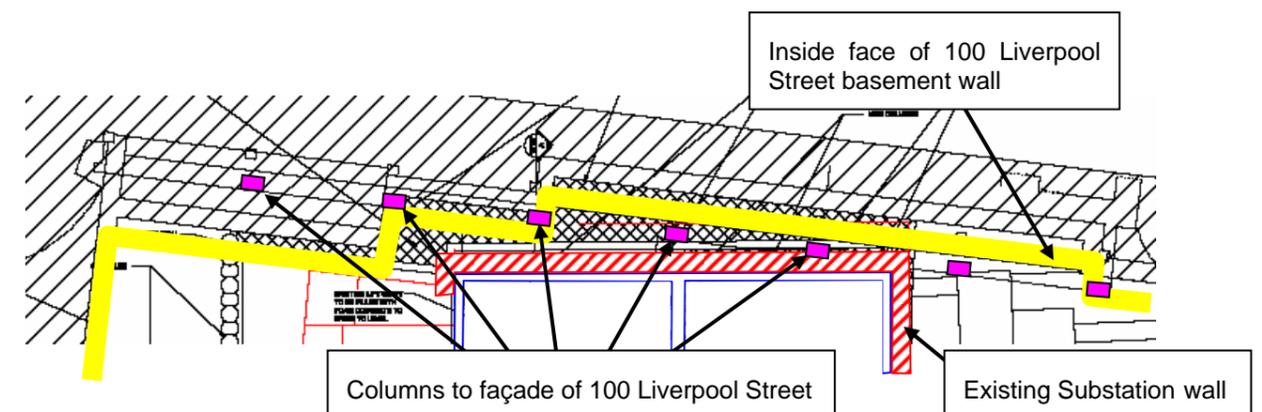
Interface between 100 Liverpool Street and Broadgate Ticket Hall
